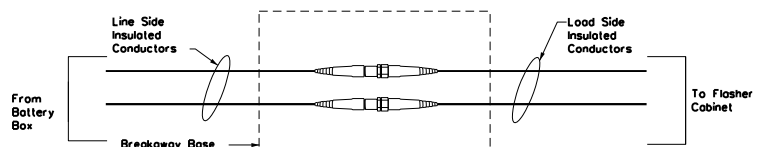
DETAIL FOR SOLAR PANEL, CABINET, AND BATTERIES LOCATED OUT OF CLEAR ZONE ON SEPARATE ALUMINUM POLE ASSEMBLY
